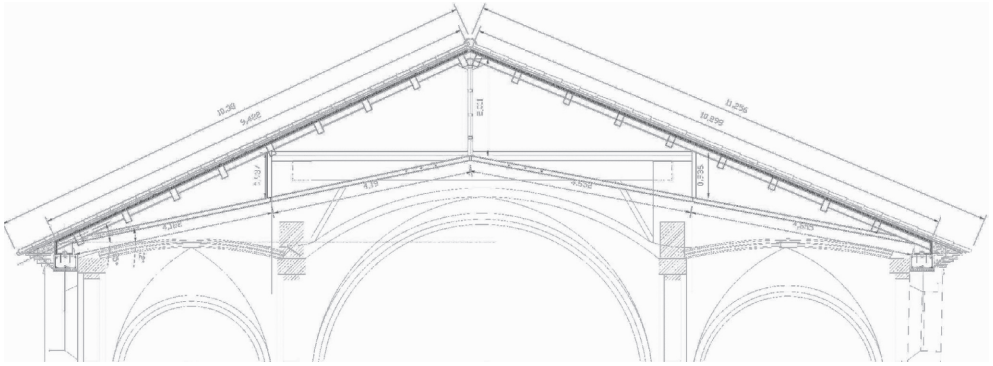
New roof structure, with a concrete tie-beam on the walls and the wood and steel trusses.
